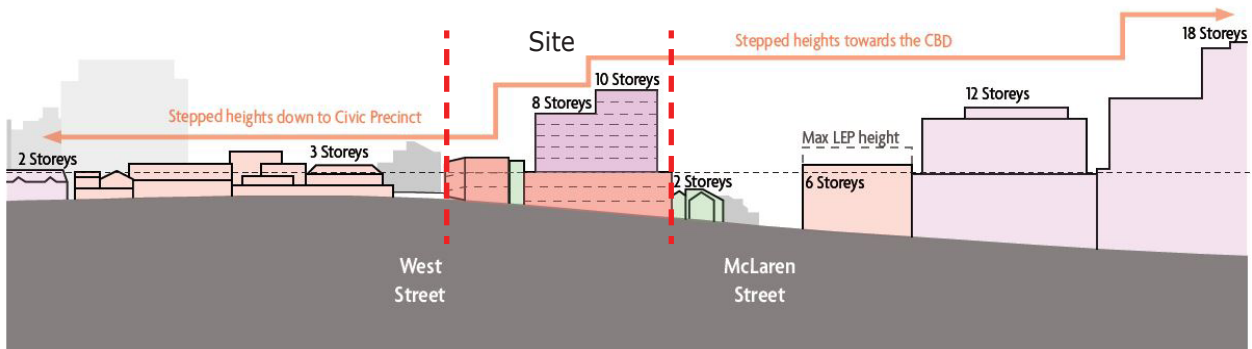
Proposed built form for the subject site (source: Civic Precinct Planning Study)
